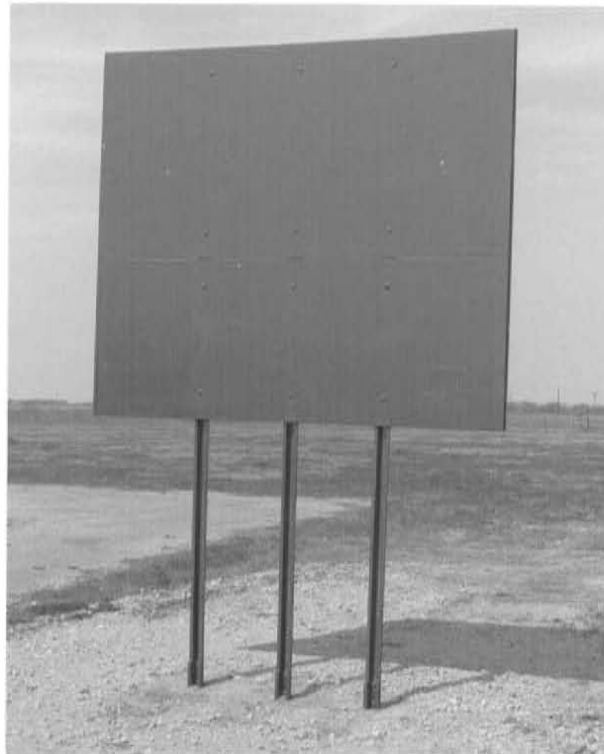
SIGN INSTALLATION USED IN TEST 7024-25.
